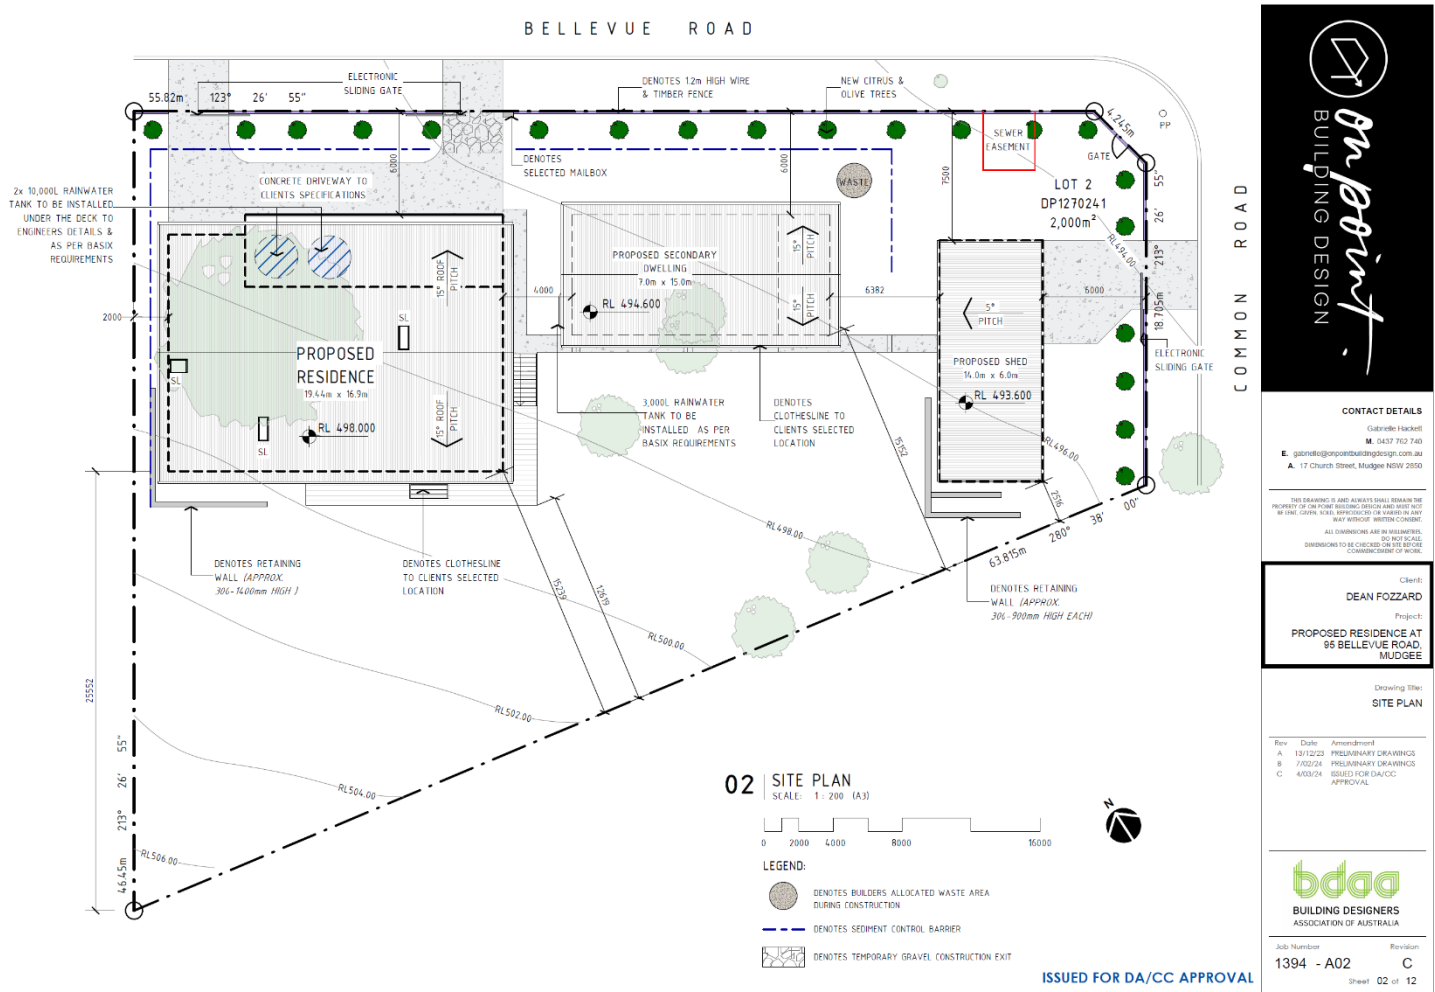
Site plan showing setbacks of >15m to south boundary. Proposed shed located >6m from dwelling.
